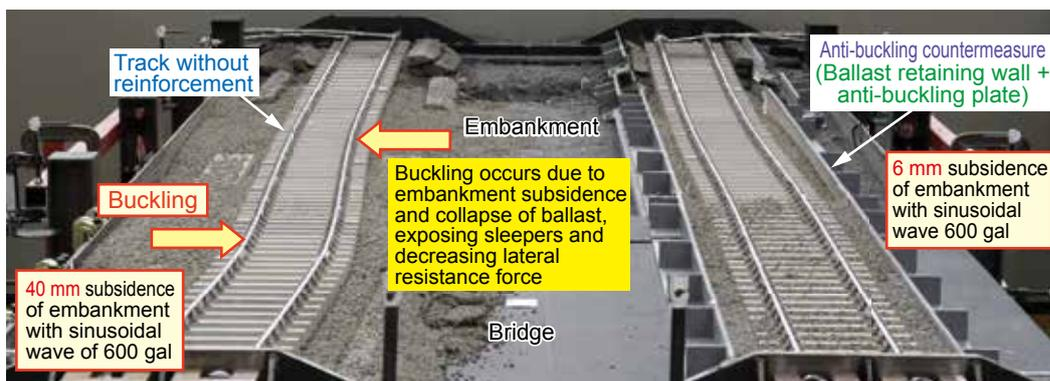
Track buckling on track without reinforcement (left) and with reinforcement (right) (with reinforced embankment)
